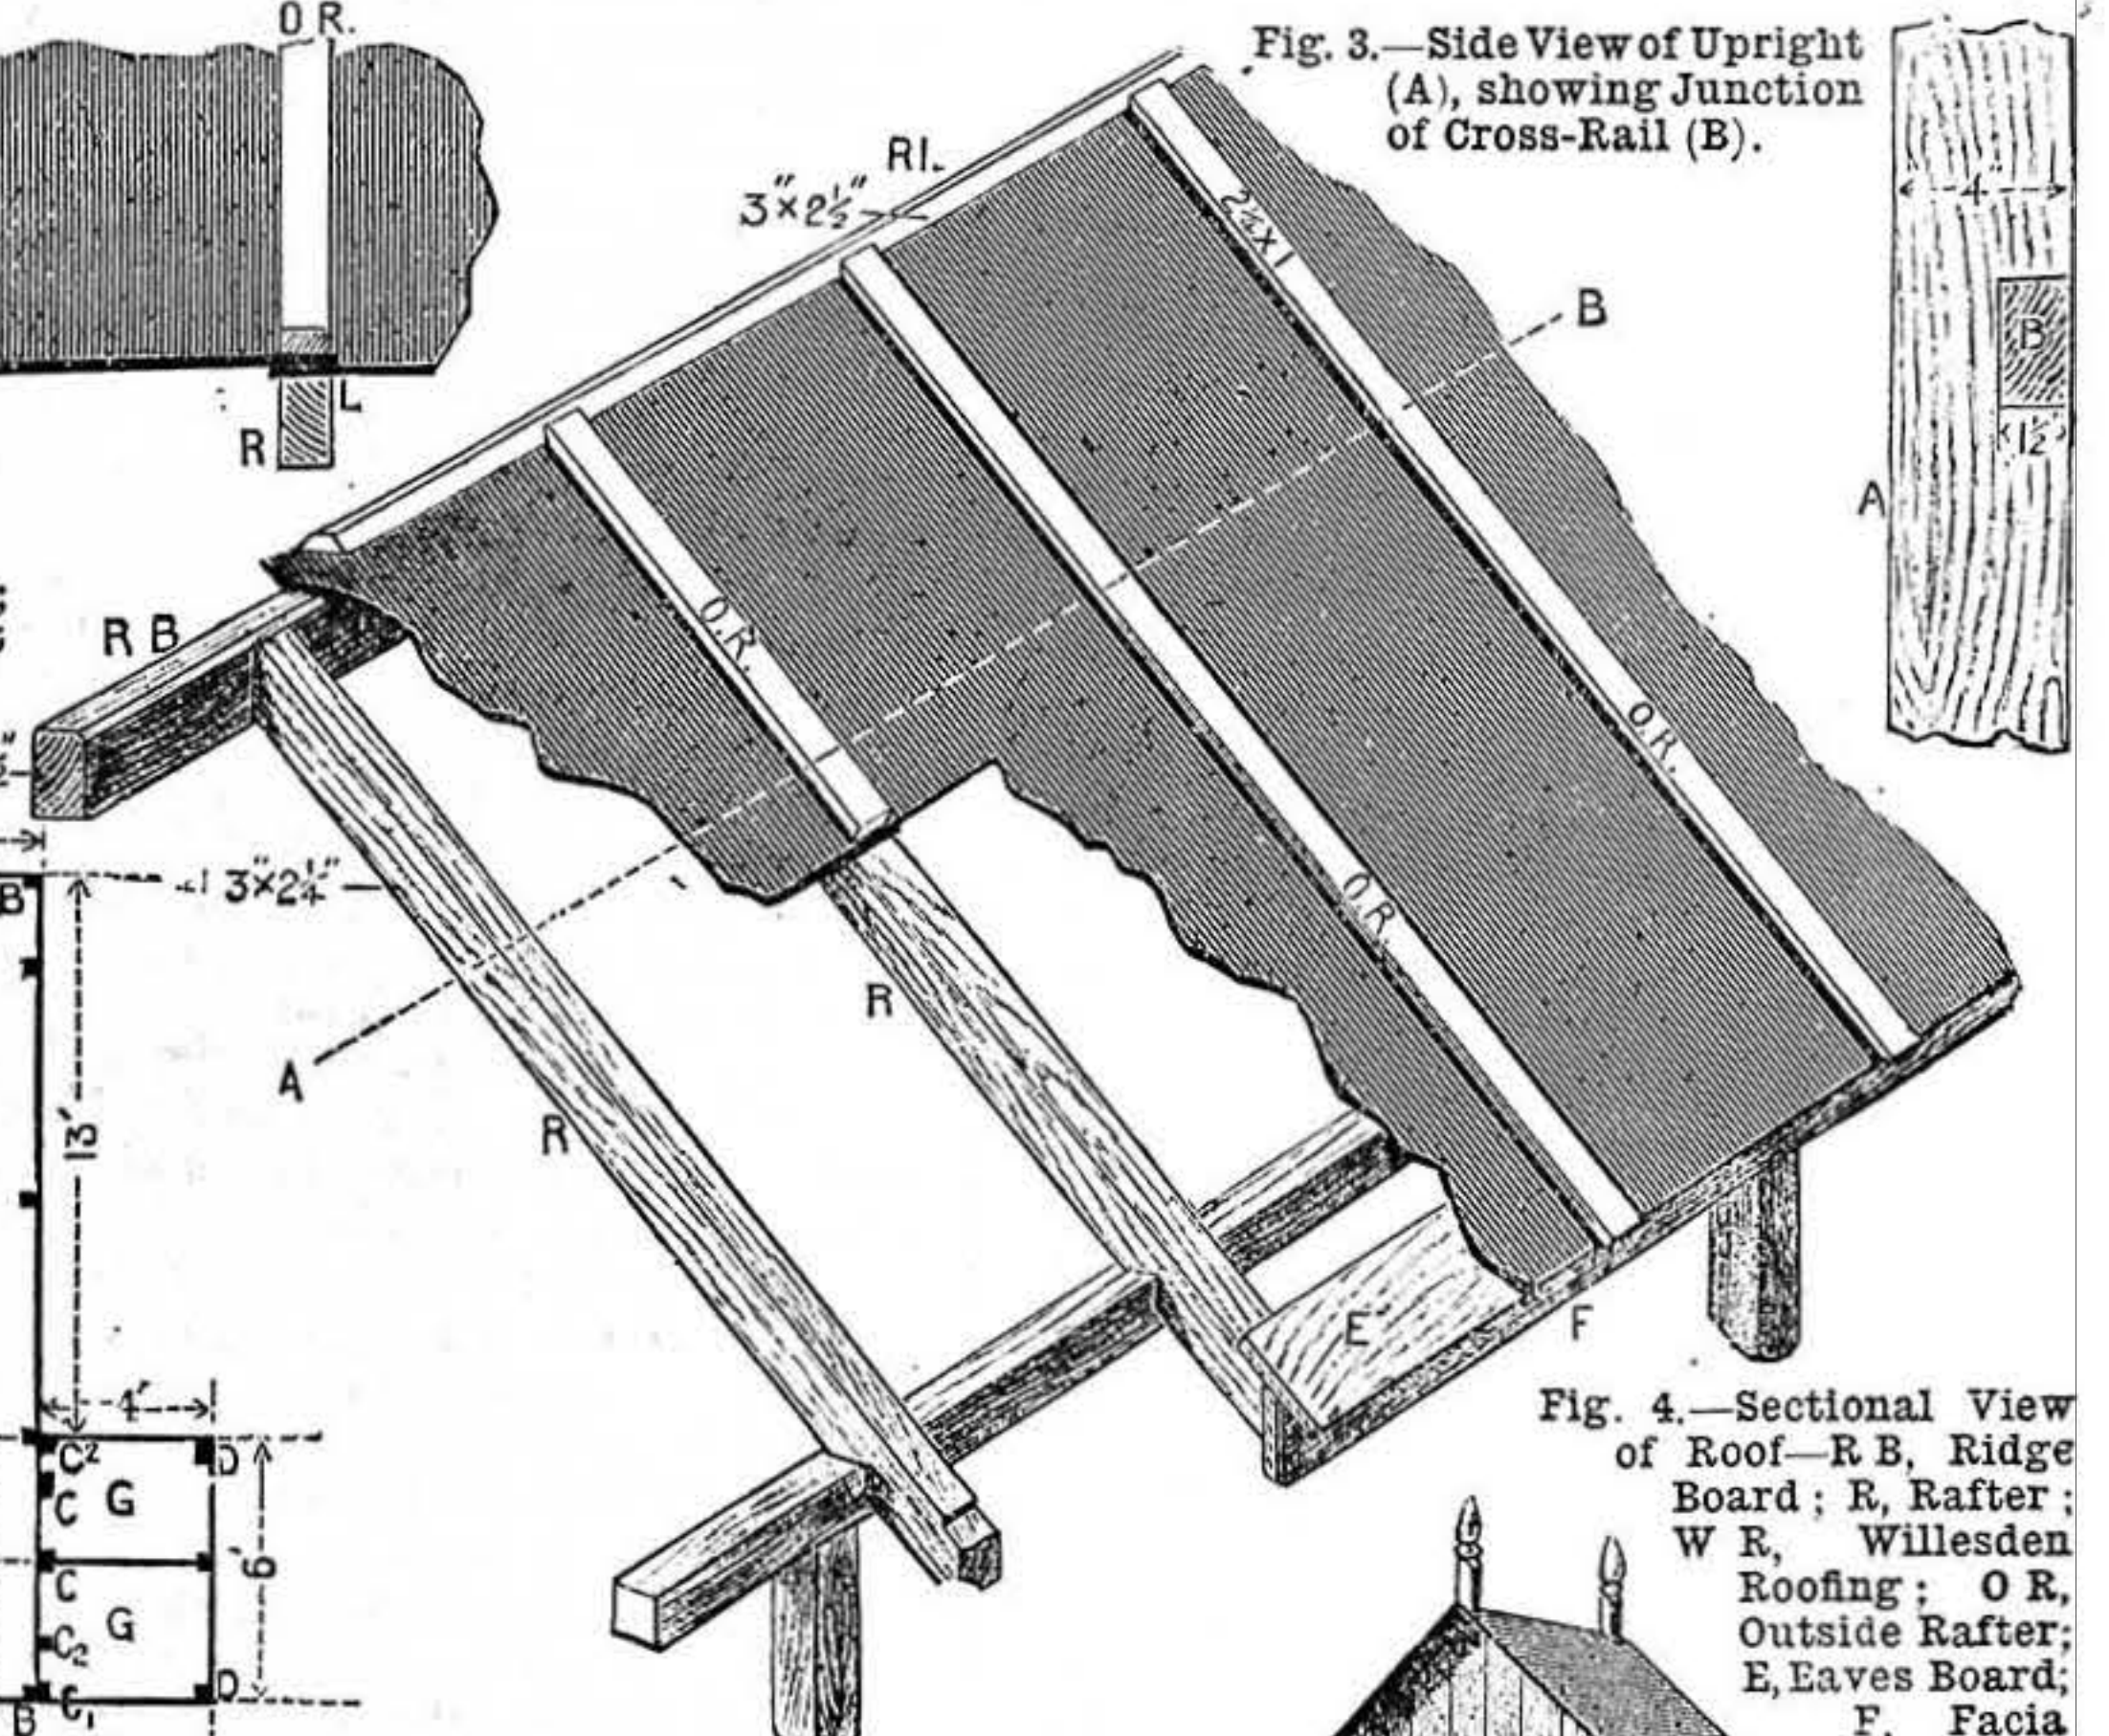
Sectional View of Roof—R B, Ridge Board; R, Rafter; W R, Willesden Roofing; O R, Outside Rafter; E, Eaves Board; F, Facia Board.
